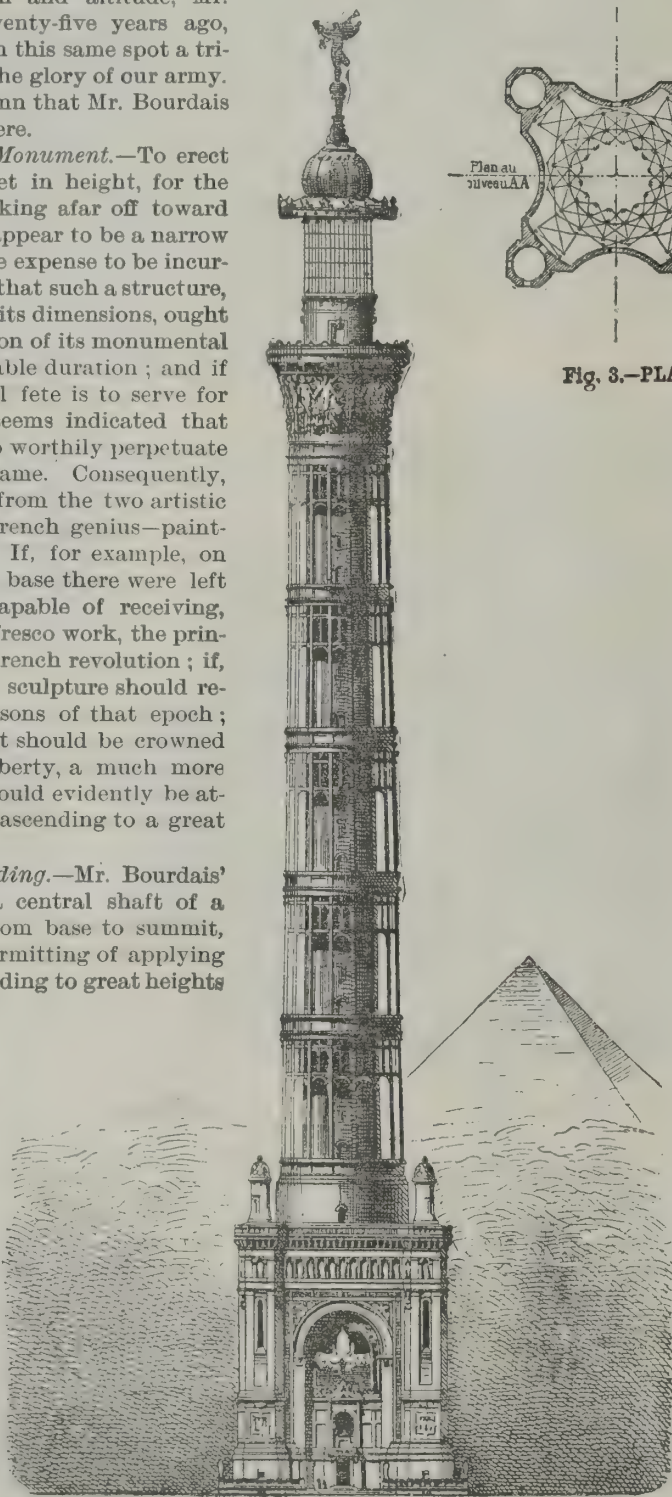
A PROJECTED TOWER 820 FEET IN HEIGHT.
